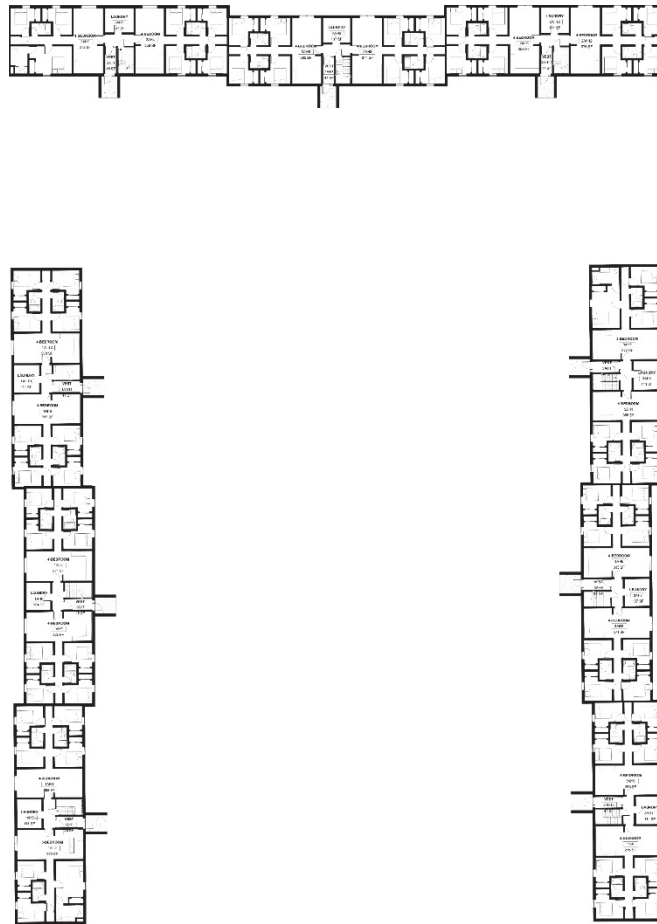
Affordable Housing Apartment Complex Level 1 Floor Plans
